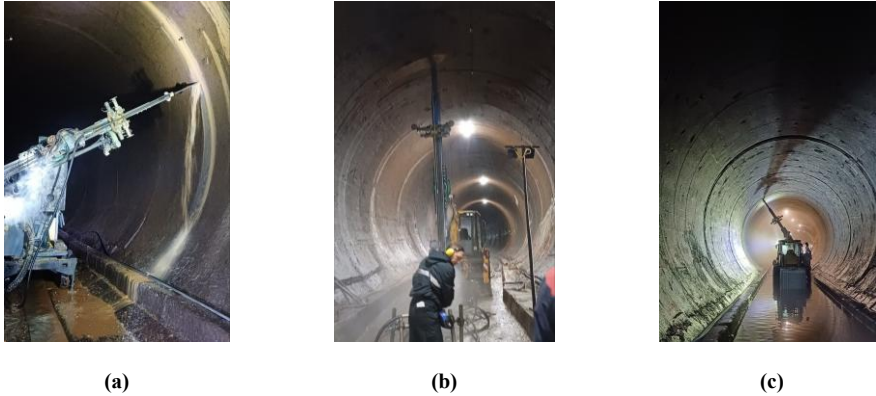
(a) Hydra Joy 2P equipped with a hydraulic hammer; (b), (c) Hydraulic hammer Hydra SL200 mounted on the JCB 3CX skip carrier.
